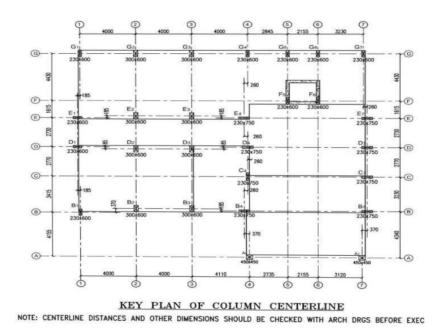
KEY PLAN OF COLUMN CENTRELINE
